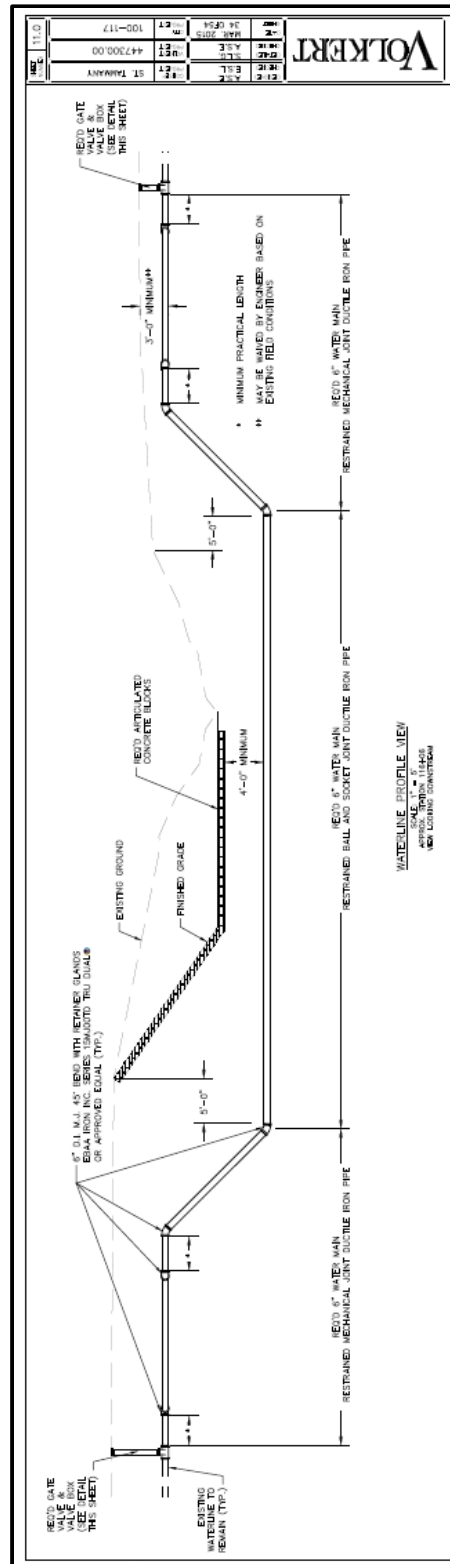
Markham-Peachtree Drainage Way: Detail of how the current drainage way will be typically altered to increase the drainage capacity. The dashed line is the existing ditch profile and the dark-hashed line is the intended final profile. Also, shows how the project addresses pipeline crossings.
